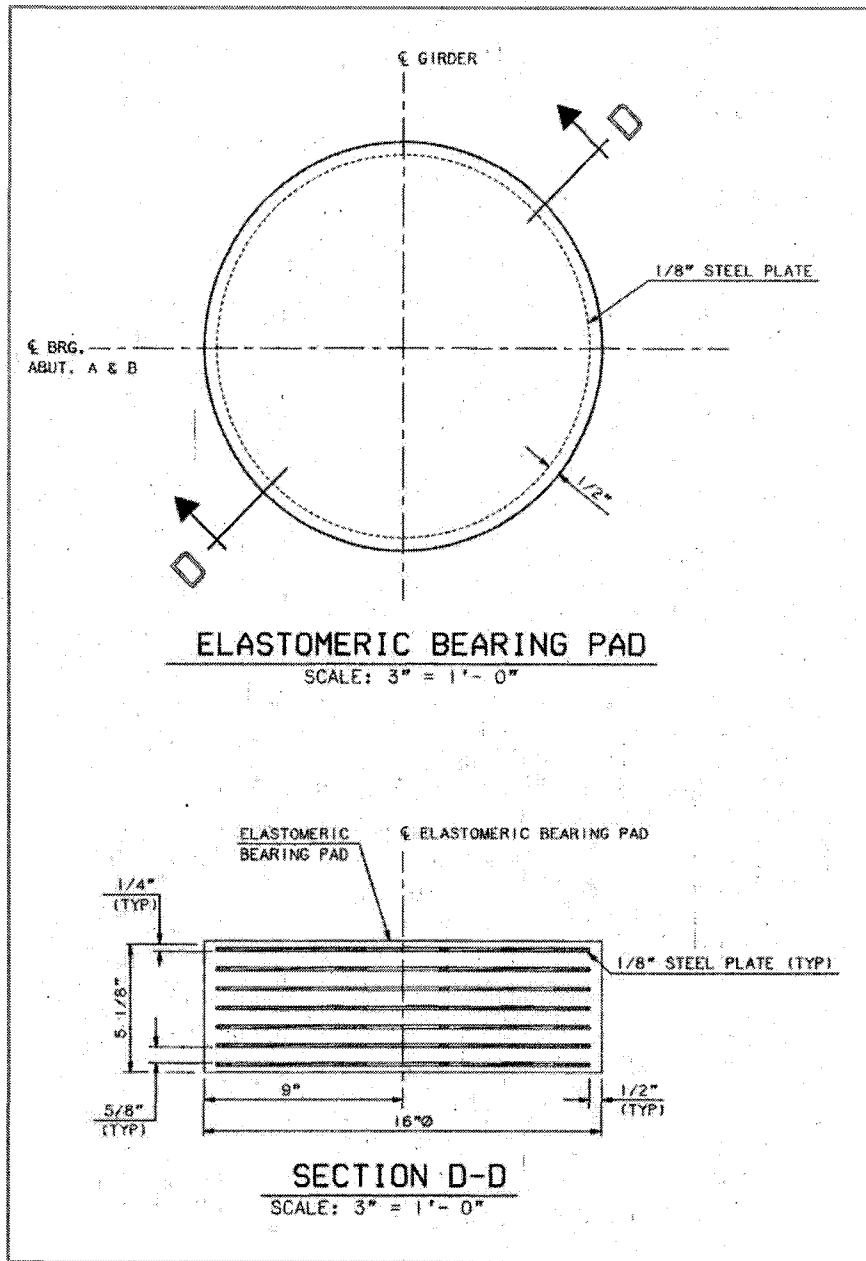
Elastomeric bearing pad details from Rollins Road Bridge Plans (NHDOT Bureau of Bridge Design, 1999)
